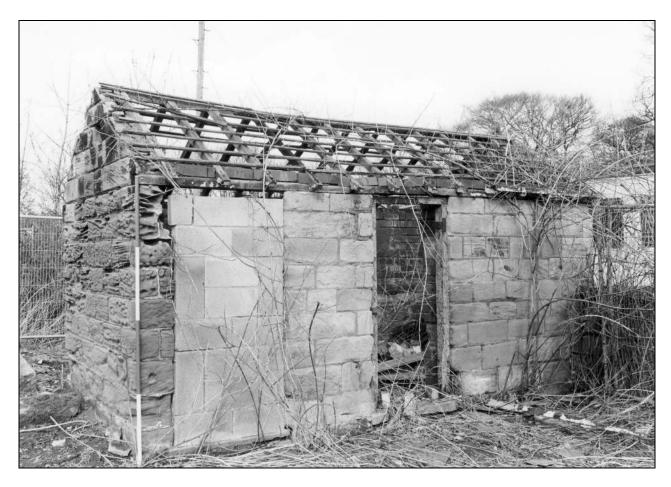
The outbuilding, from the south-west (film 3, frame 6)
